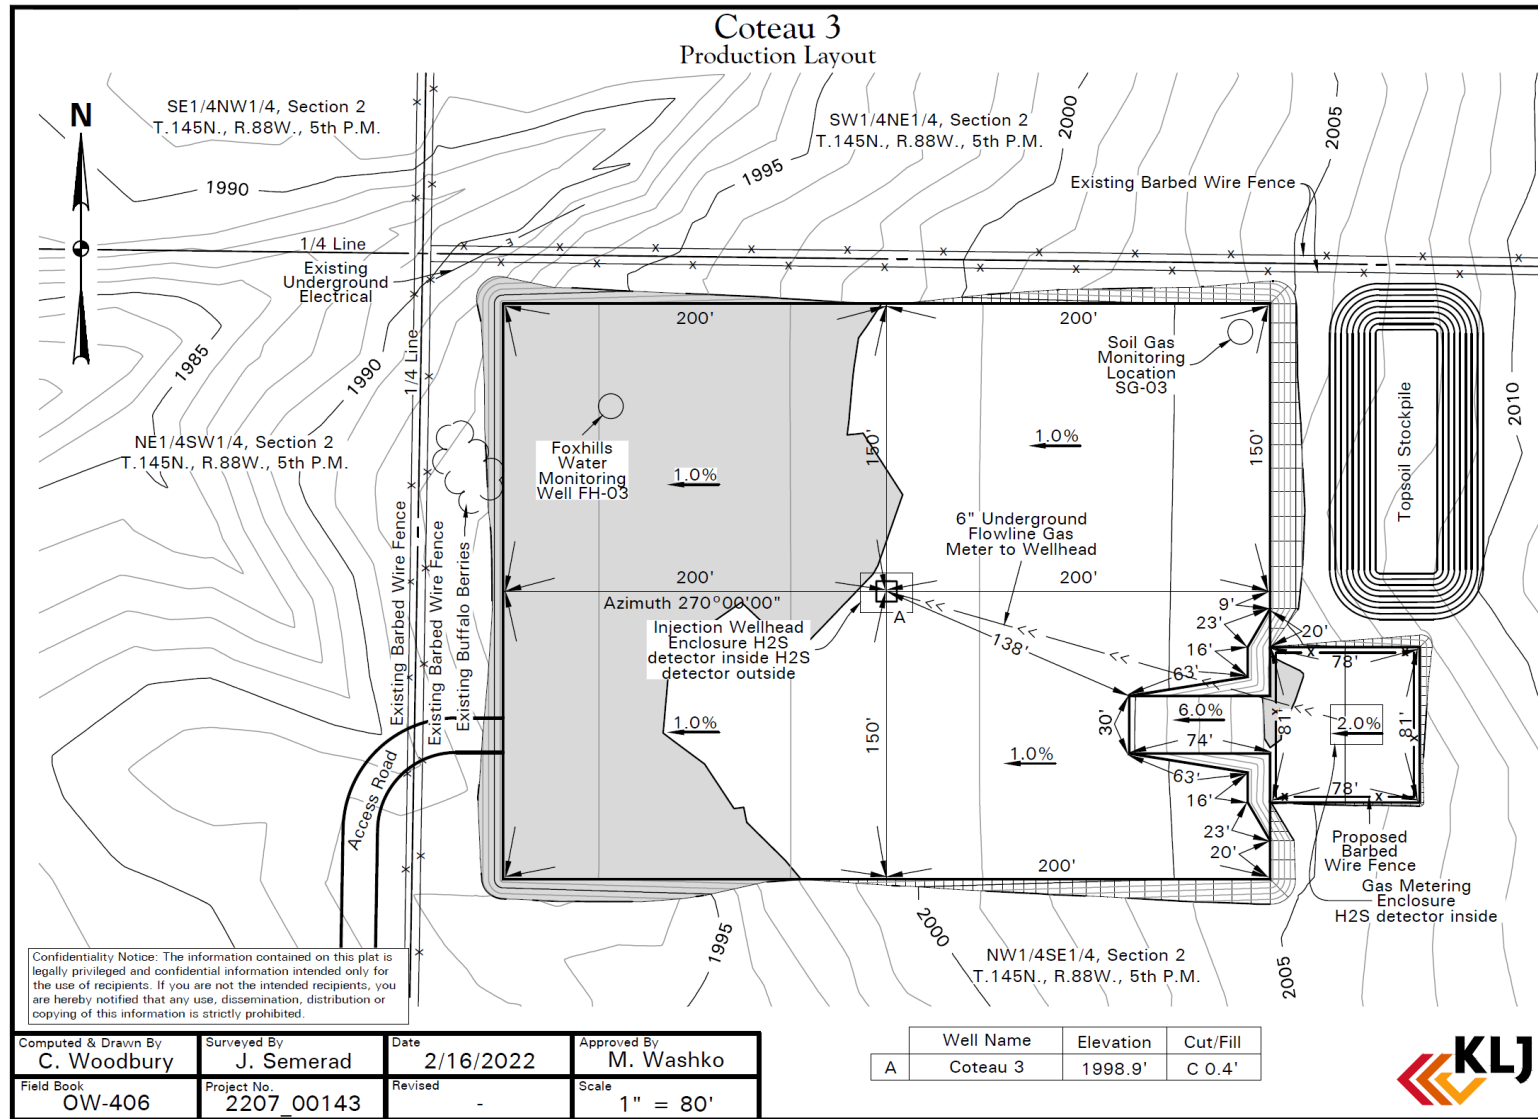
C. Well pad drawing of the Coteau 3 well location.
